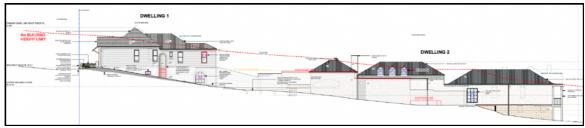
Eastern elevation showing the contravention being the new construction above the red dashed line.
